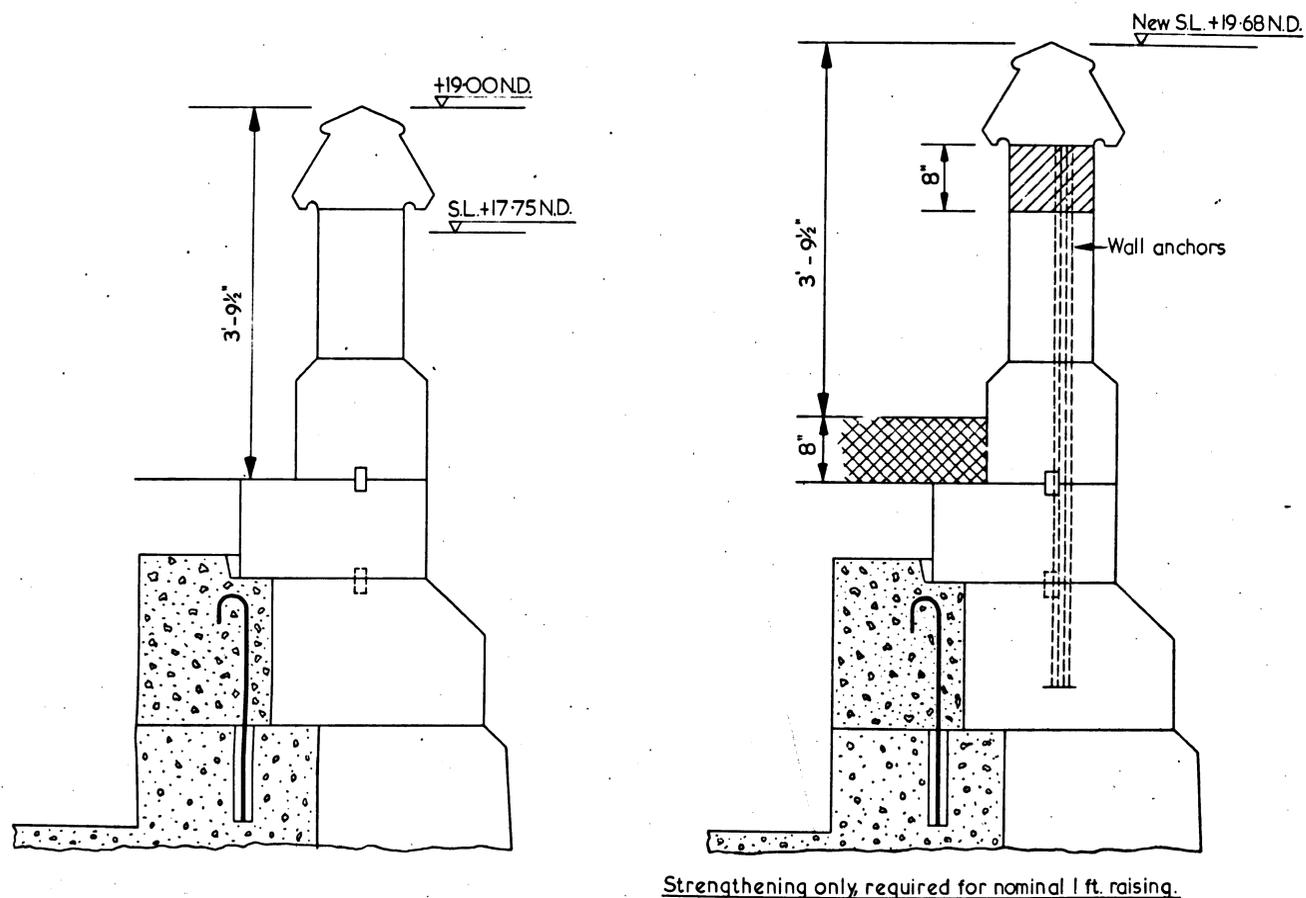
EMBANKMENT WALL RAISINGS VICTORIA TOWER GARDENS NORTH
